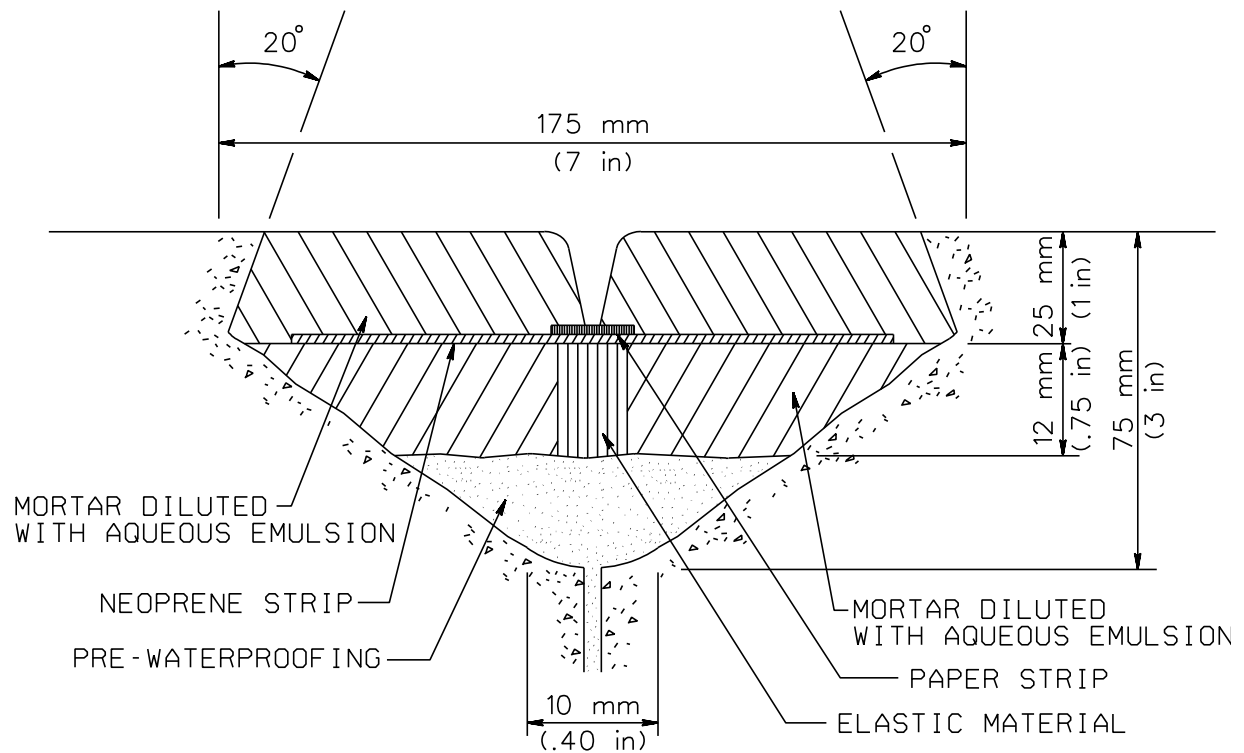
Repair of a Concrete Joint or Crack by Inclusion of a Neoprene Strip (FHWA, 2005)
